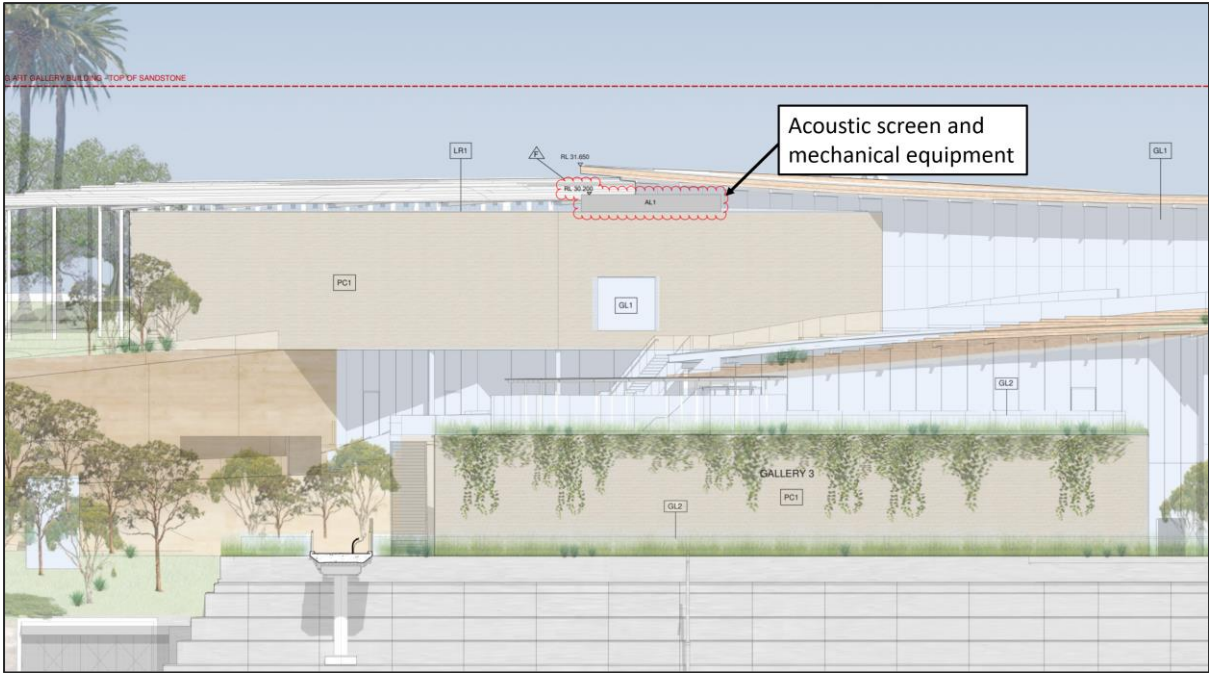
| East Elevation – proposed changes outlined in red (Base source: Applicant)
